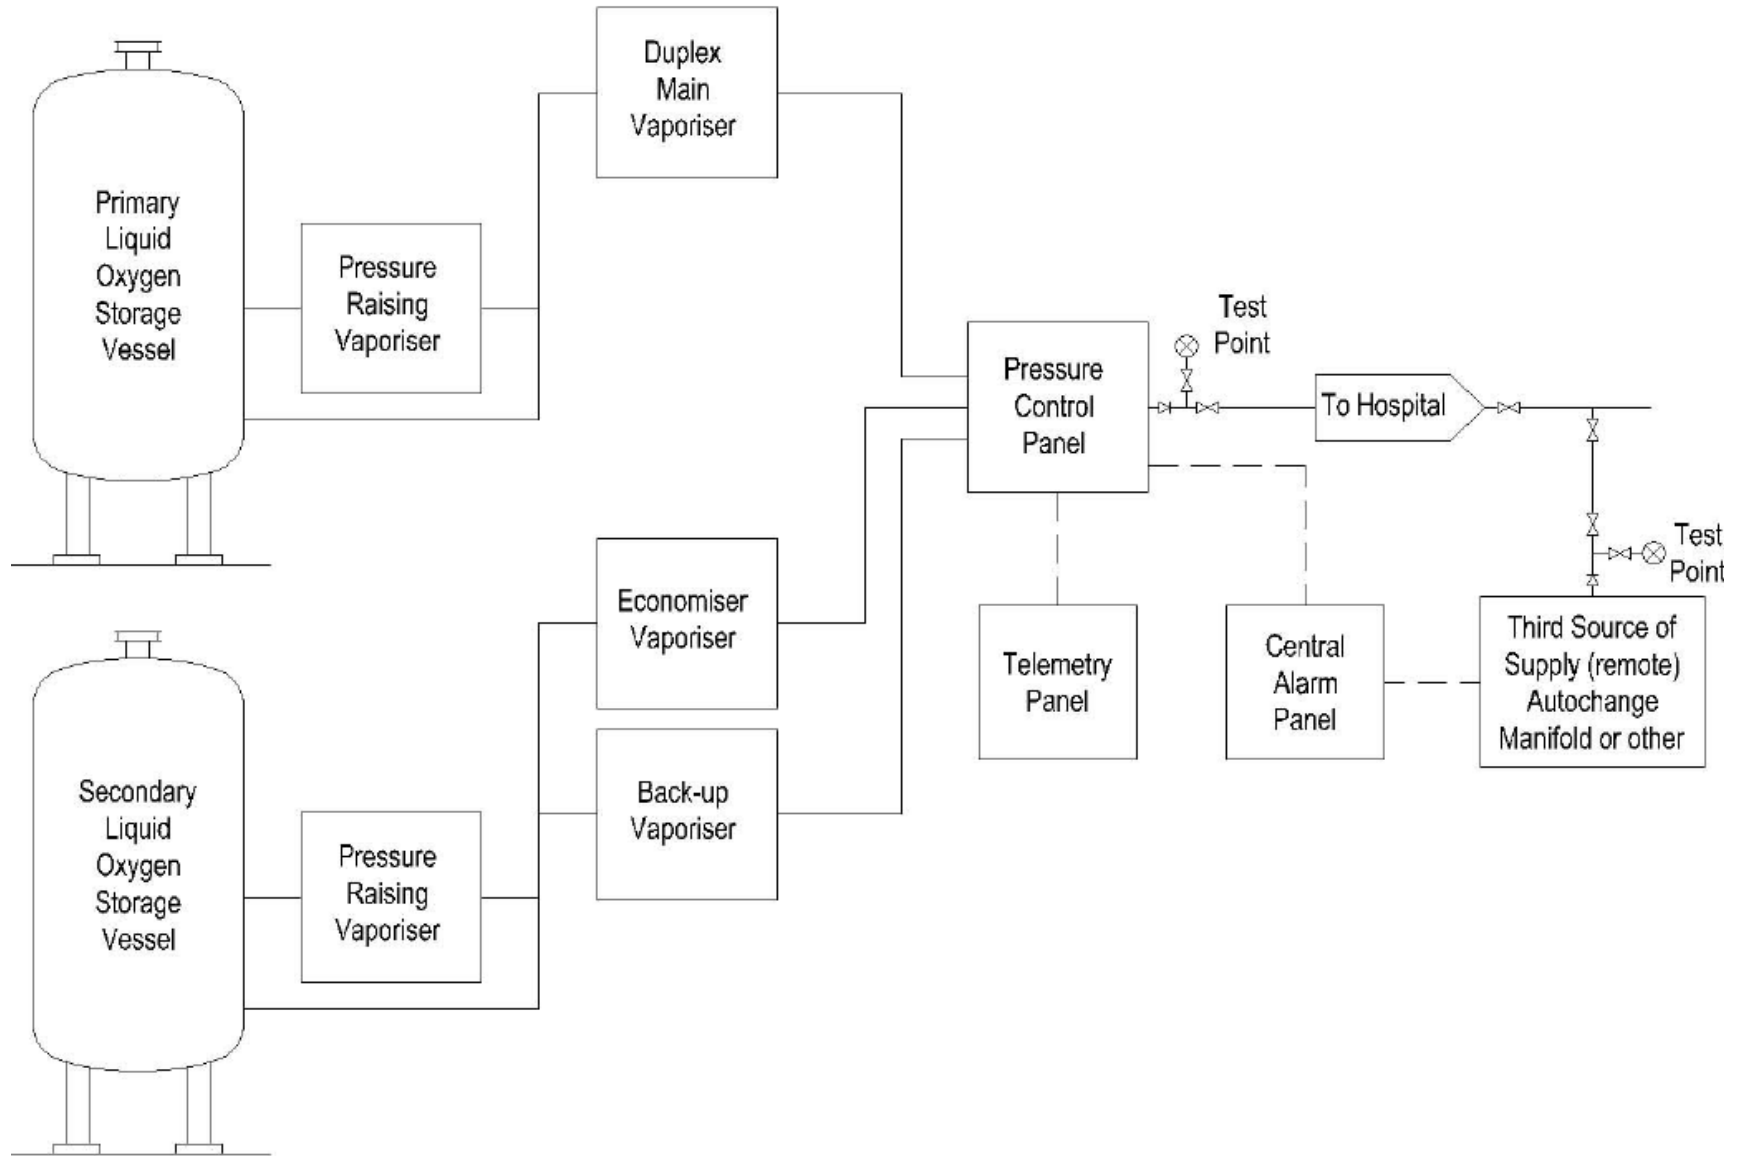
Primary and secondary supply VIE system on single plinth with remote third source supply compressed gas cylinder manifold
